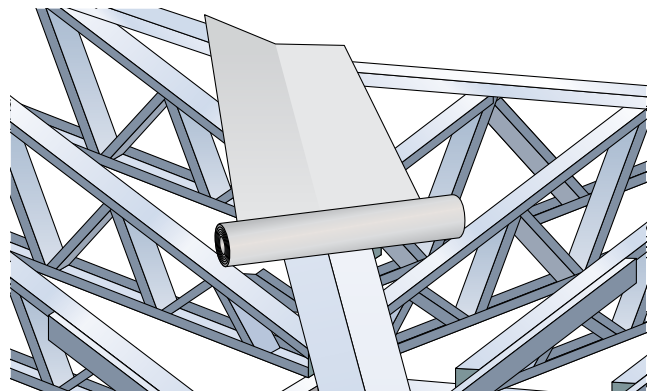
Installing the underlay from the top valley, note approach is from a fully battened section of roof
